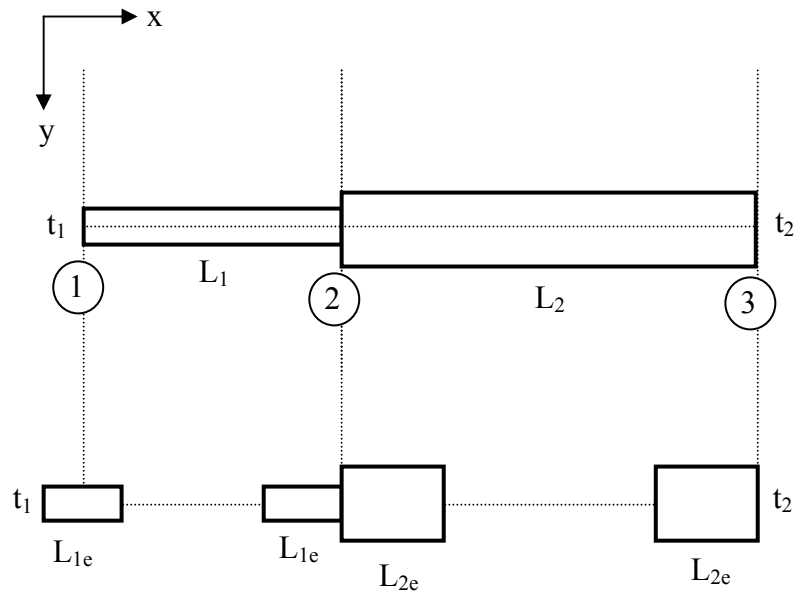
Equivalent Column Designation for Adjacent Shear Walls
